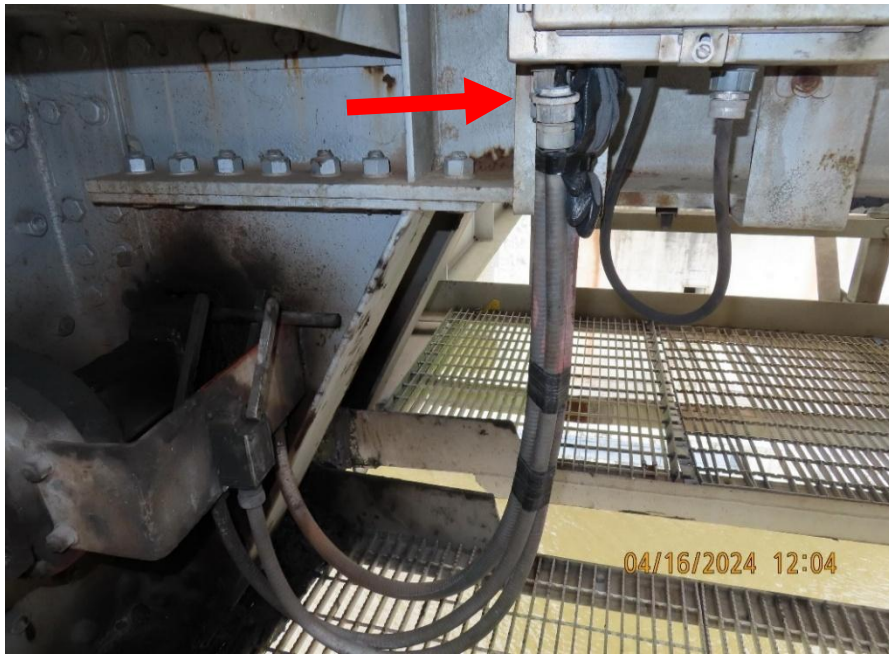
Flex conduit and a flex cable exiting an enclosure. Note broken coupling and tape used to provide support.
